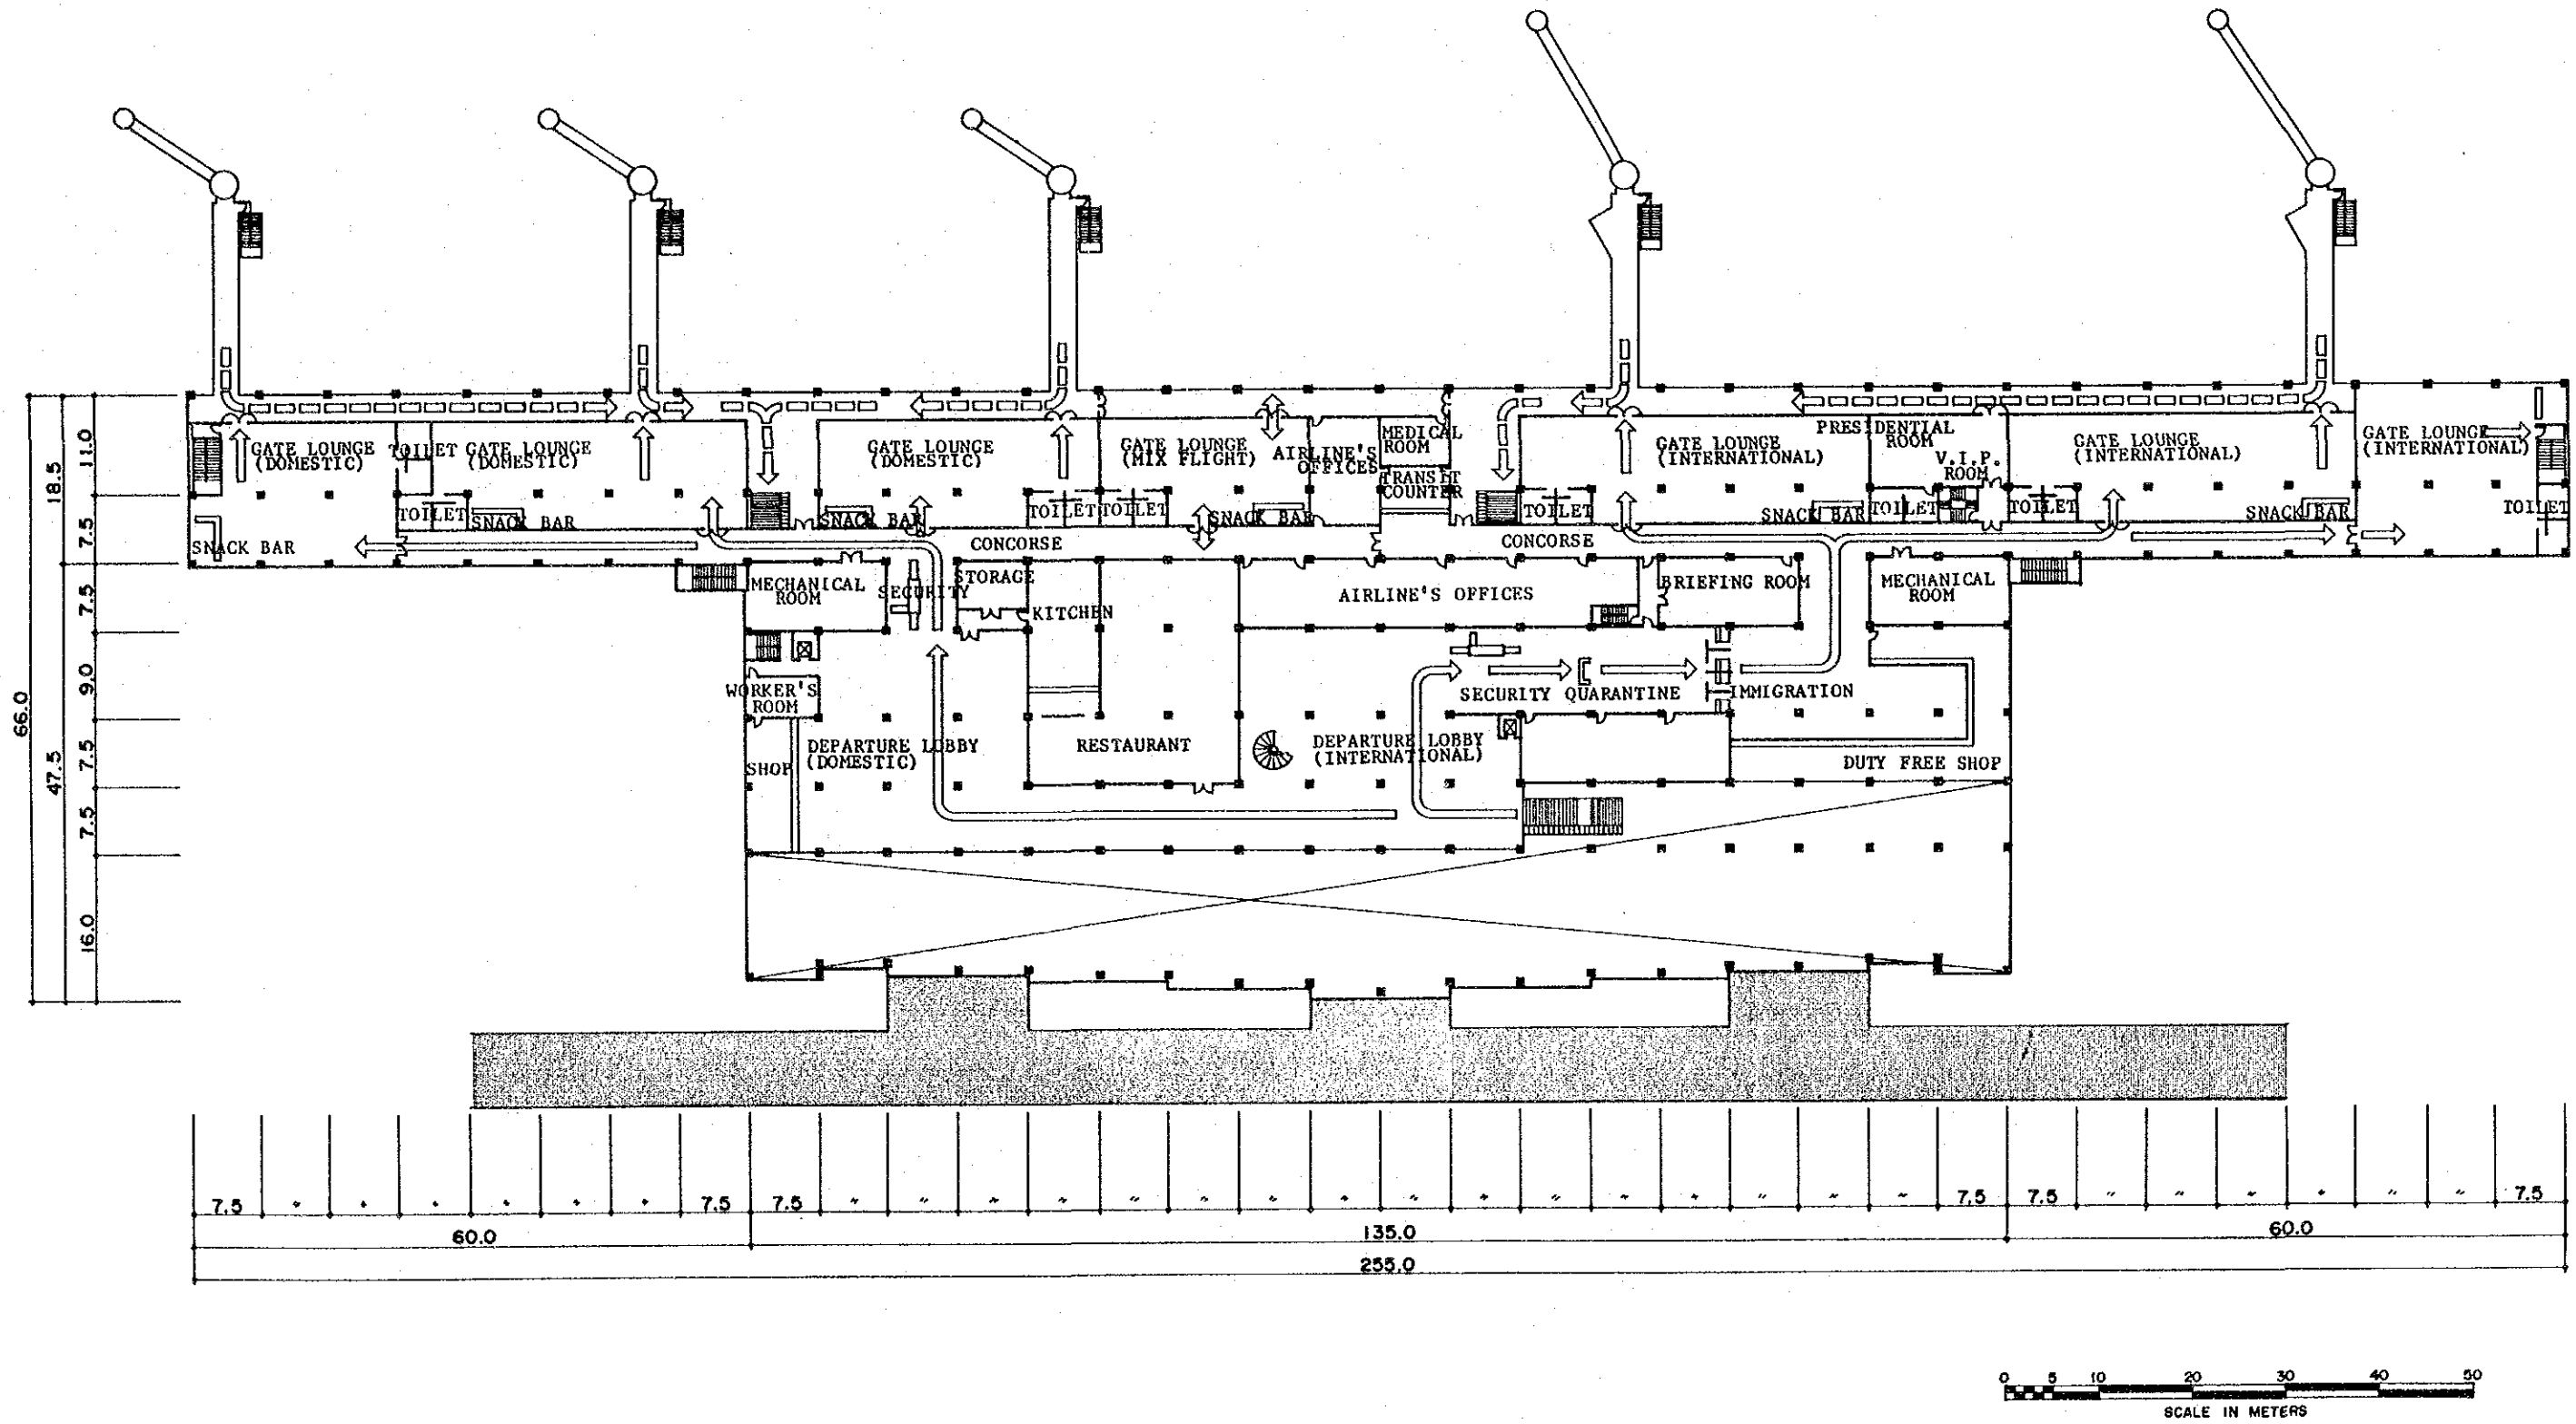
Passenger Terminal Building First Floor Plan
